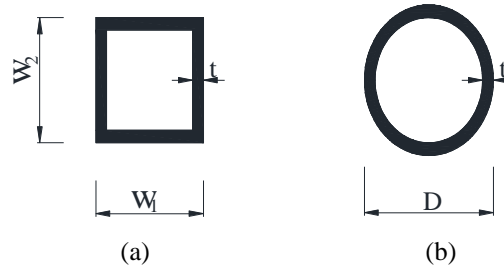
(a) Vertical columns and beams cross section, (b) Diagrid cross section
